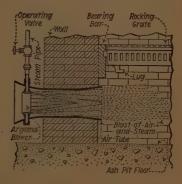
Argand type steamjet blower installed in side-wall for forcing draft through ash-pit.
